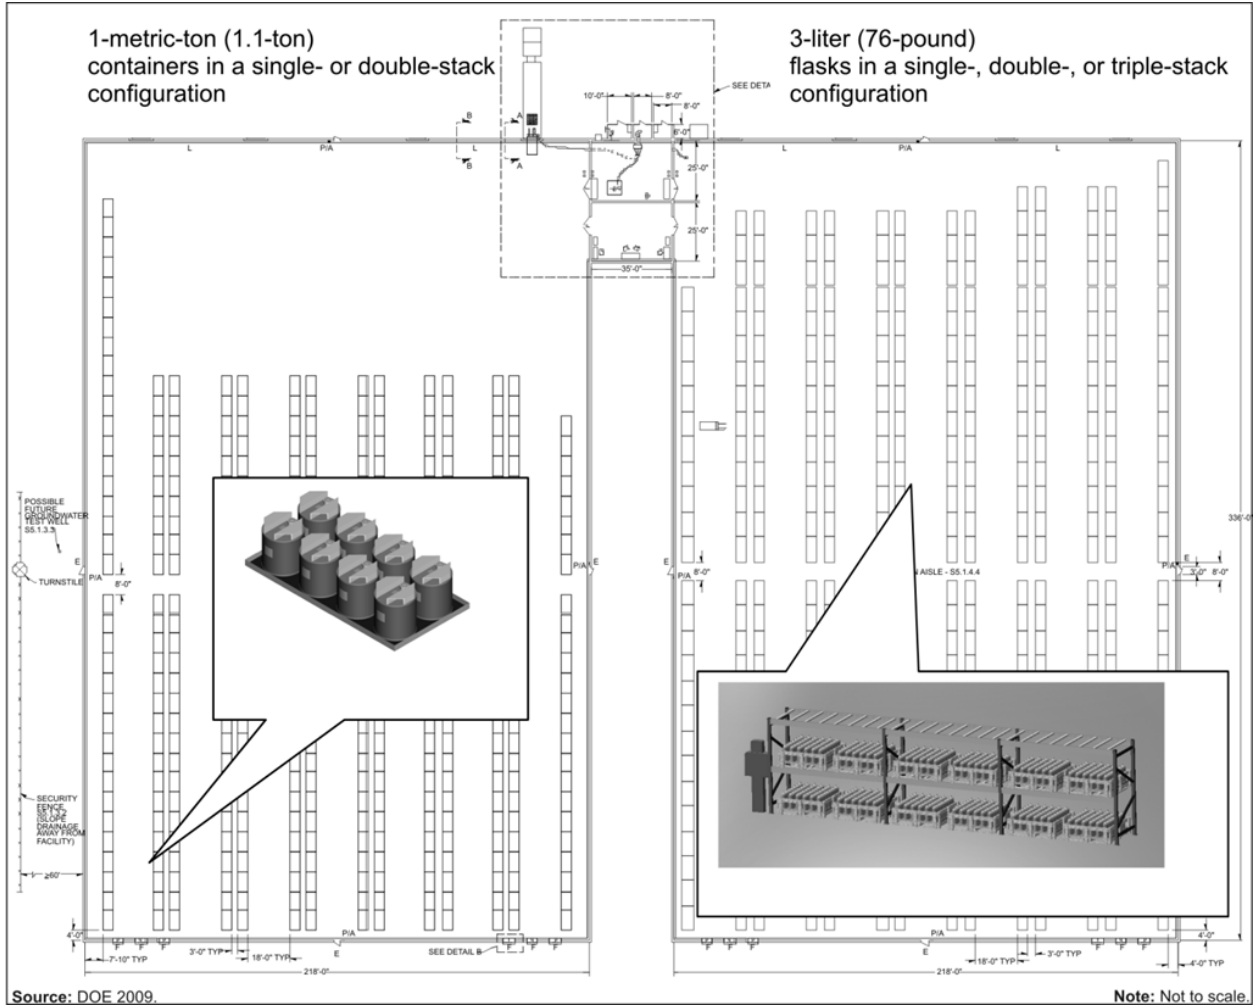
Conceptual Layout for a New Mercury Storage Facility
